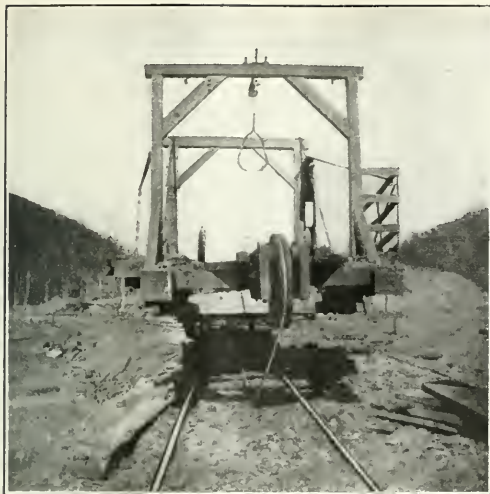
VIEW FROM THE FRONT, SHOWING SHEAVE
